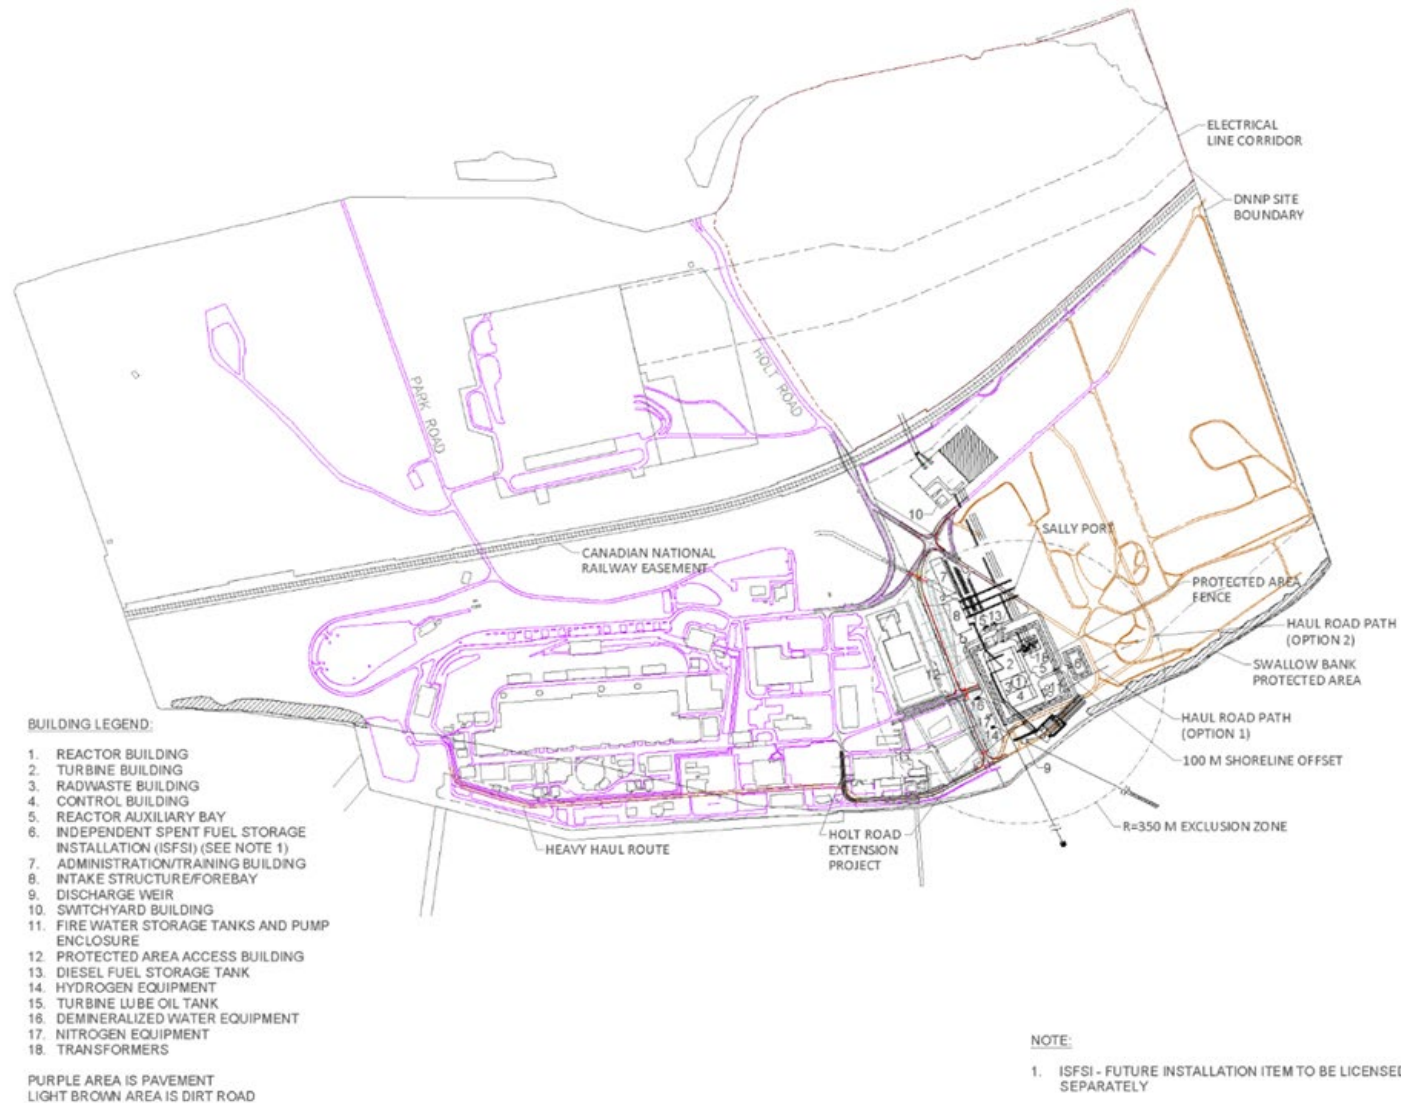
Preliminary Proposed Site Layout for Construction at DNNP Site
